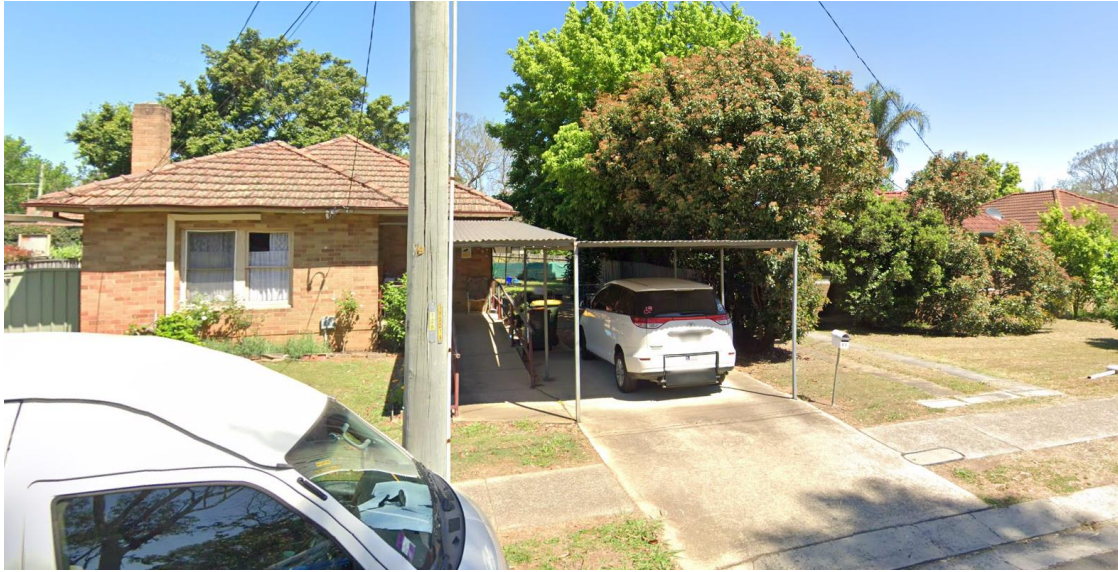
Development site – 61 Bourke Street, (Source: Google Street View)
